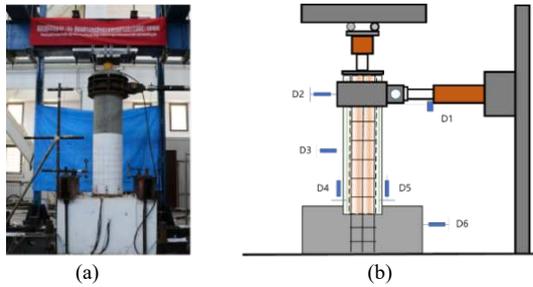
Pile-cap connection in the quasi-static test (a) photo and (b) sketch of the model test setup.
